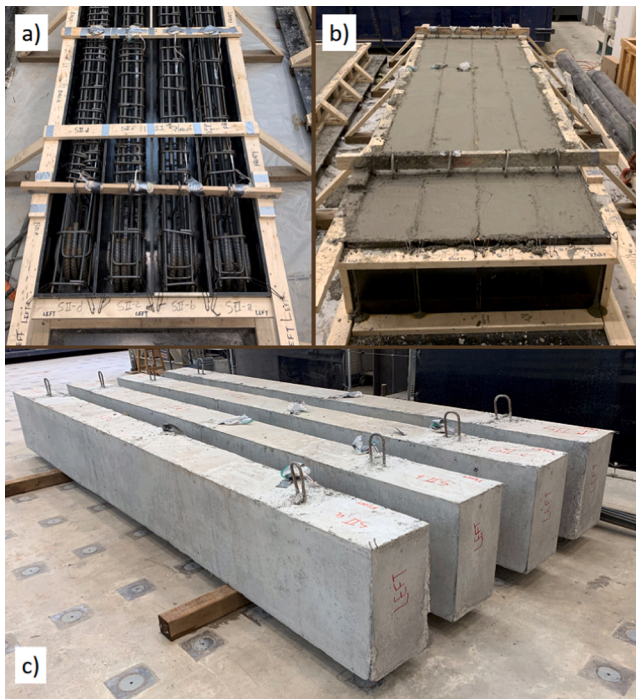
Specimens preparation: a) formwork and reinforcement cage before the concrete casting; b) specimens after the concrete casting; and c) specimens after the concrete curing.
